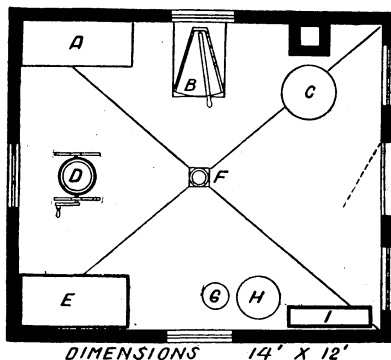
Floor plan showing arrangement of equipment in small dairy house suitable for dairy of 30 cows.
